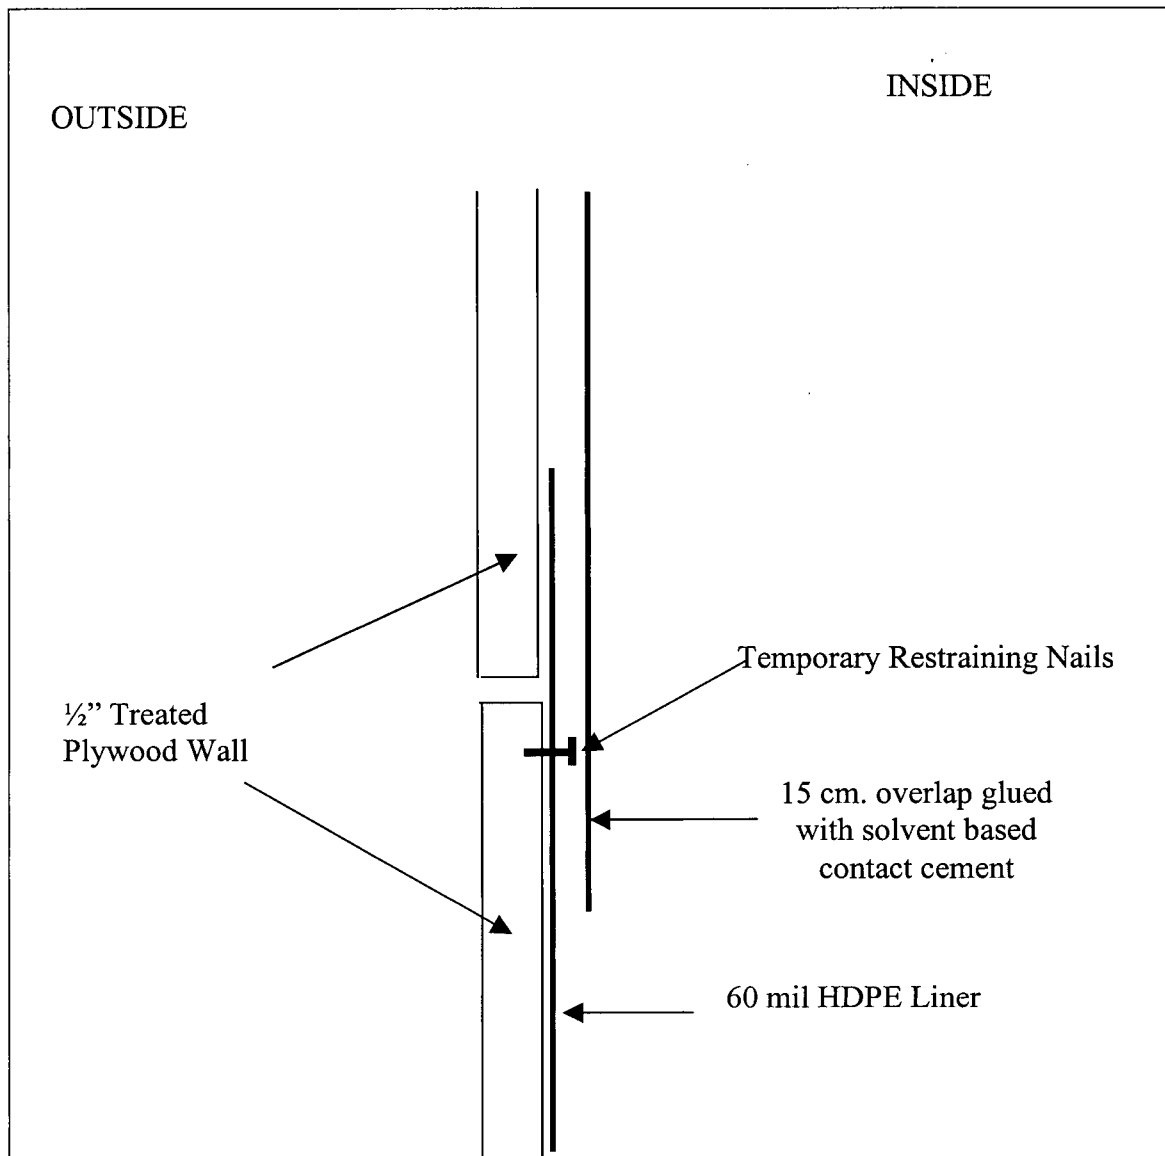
Detail Cross Section of HDPE Wall Liner Overlap
